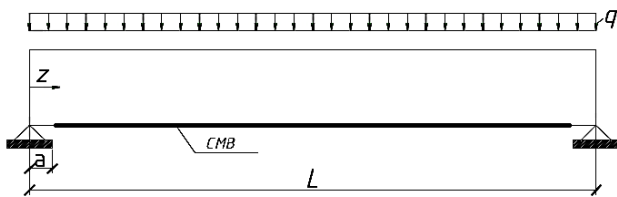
Scheme of geometric parameters of the reinforced concrete structure:
